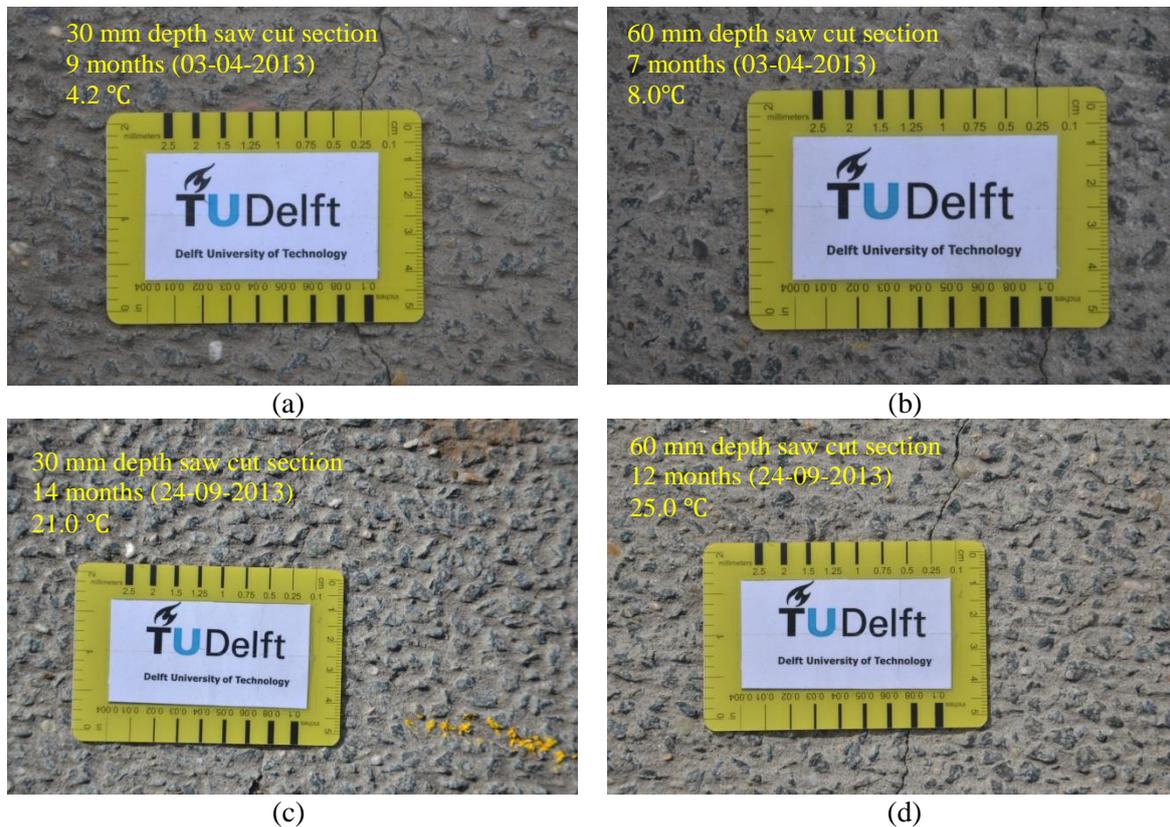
Crack width on the pavement surface of E313 (a) 30 mm section in low temperature ; (b) 60 mm section in low temperature; (c) 30 mm section in low temperature ; (d) 60 mm section in high temperature.
